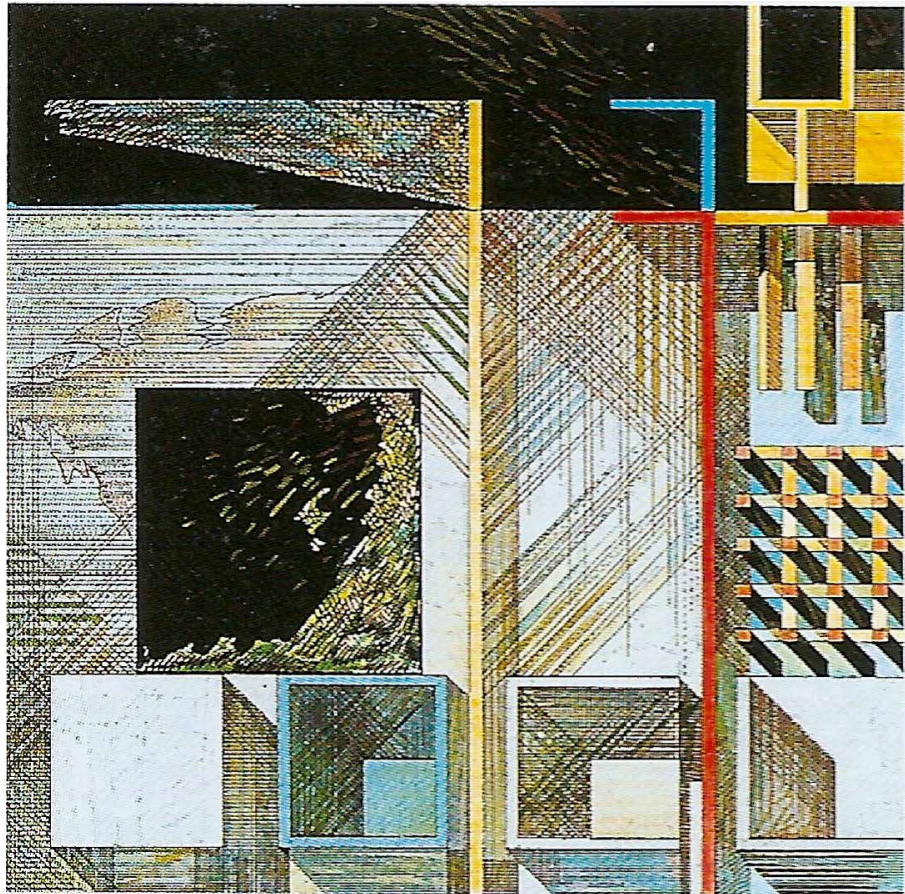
Wall skyscraper. Elevation detail.
